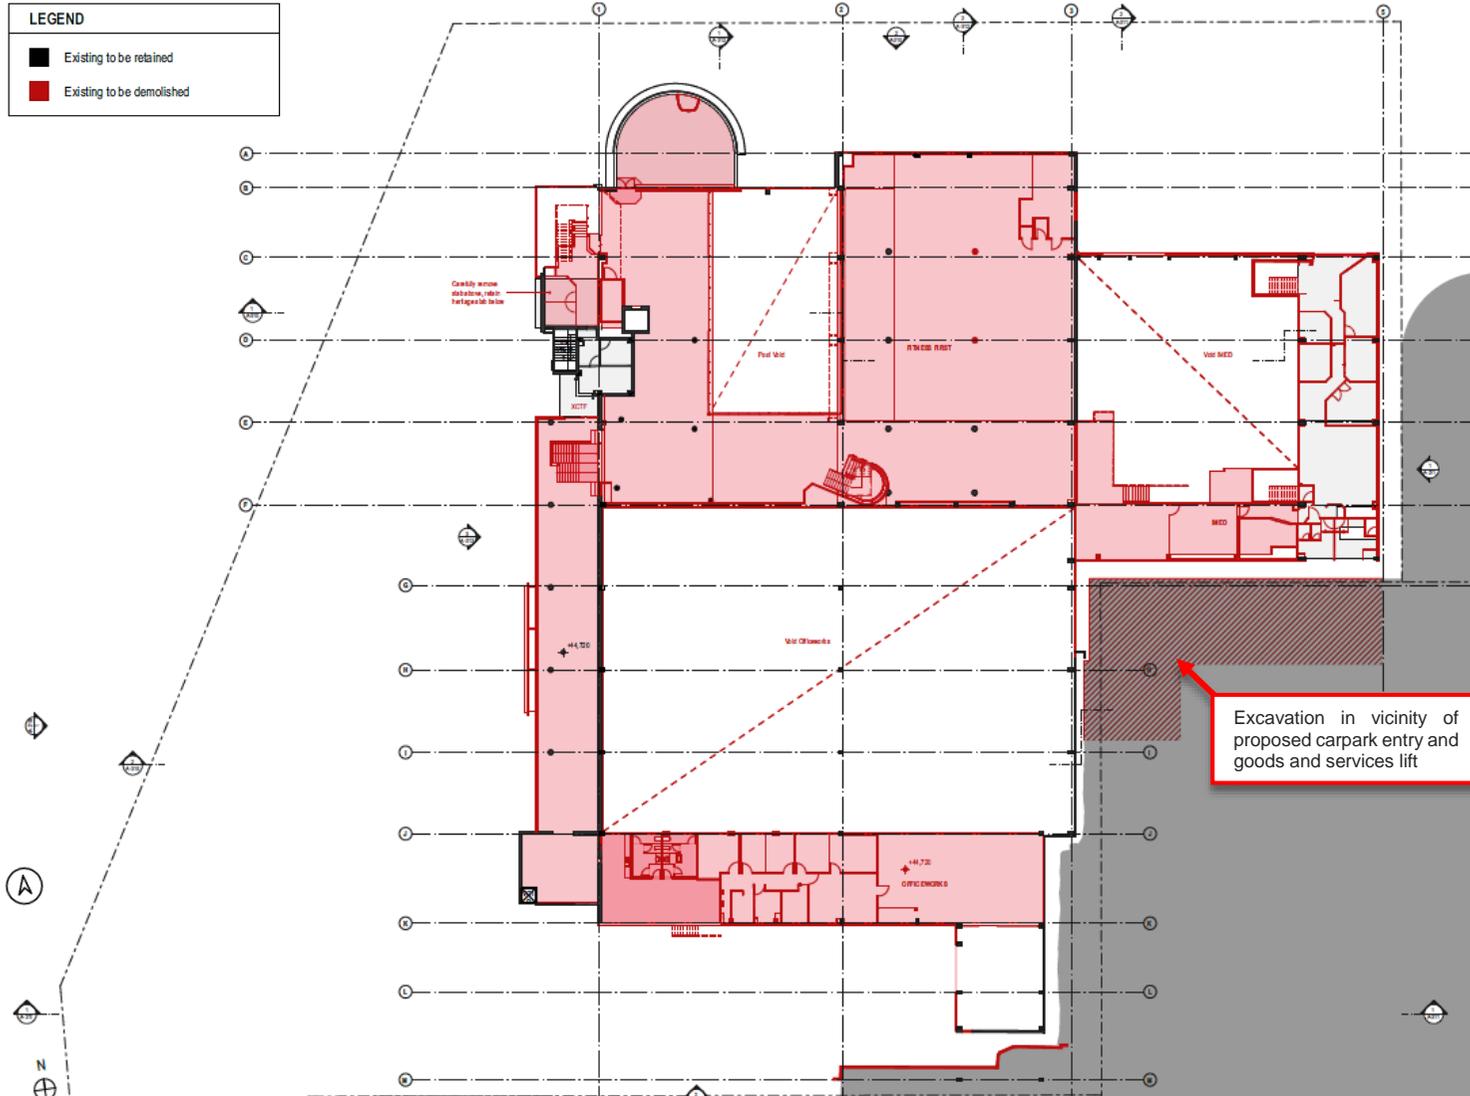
Extent of proposed excavations at Level 2, 800 Pittwater Road (Source: Level 2 Demolition Plan\_800, A-032, Rev A, 29/10/2019, Tonkin Zulaikha Greer Architects)
